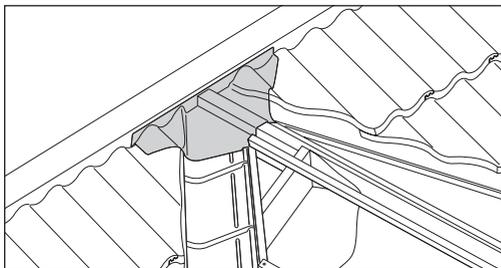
Saddle at ridge/roof/valley intersection (interlocking tiles)
